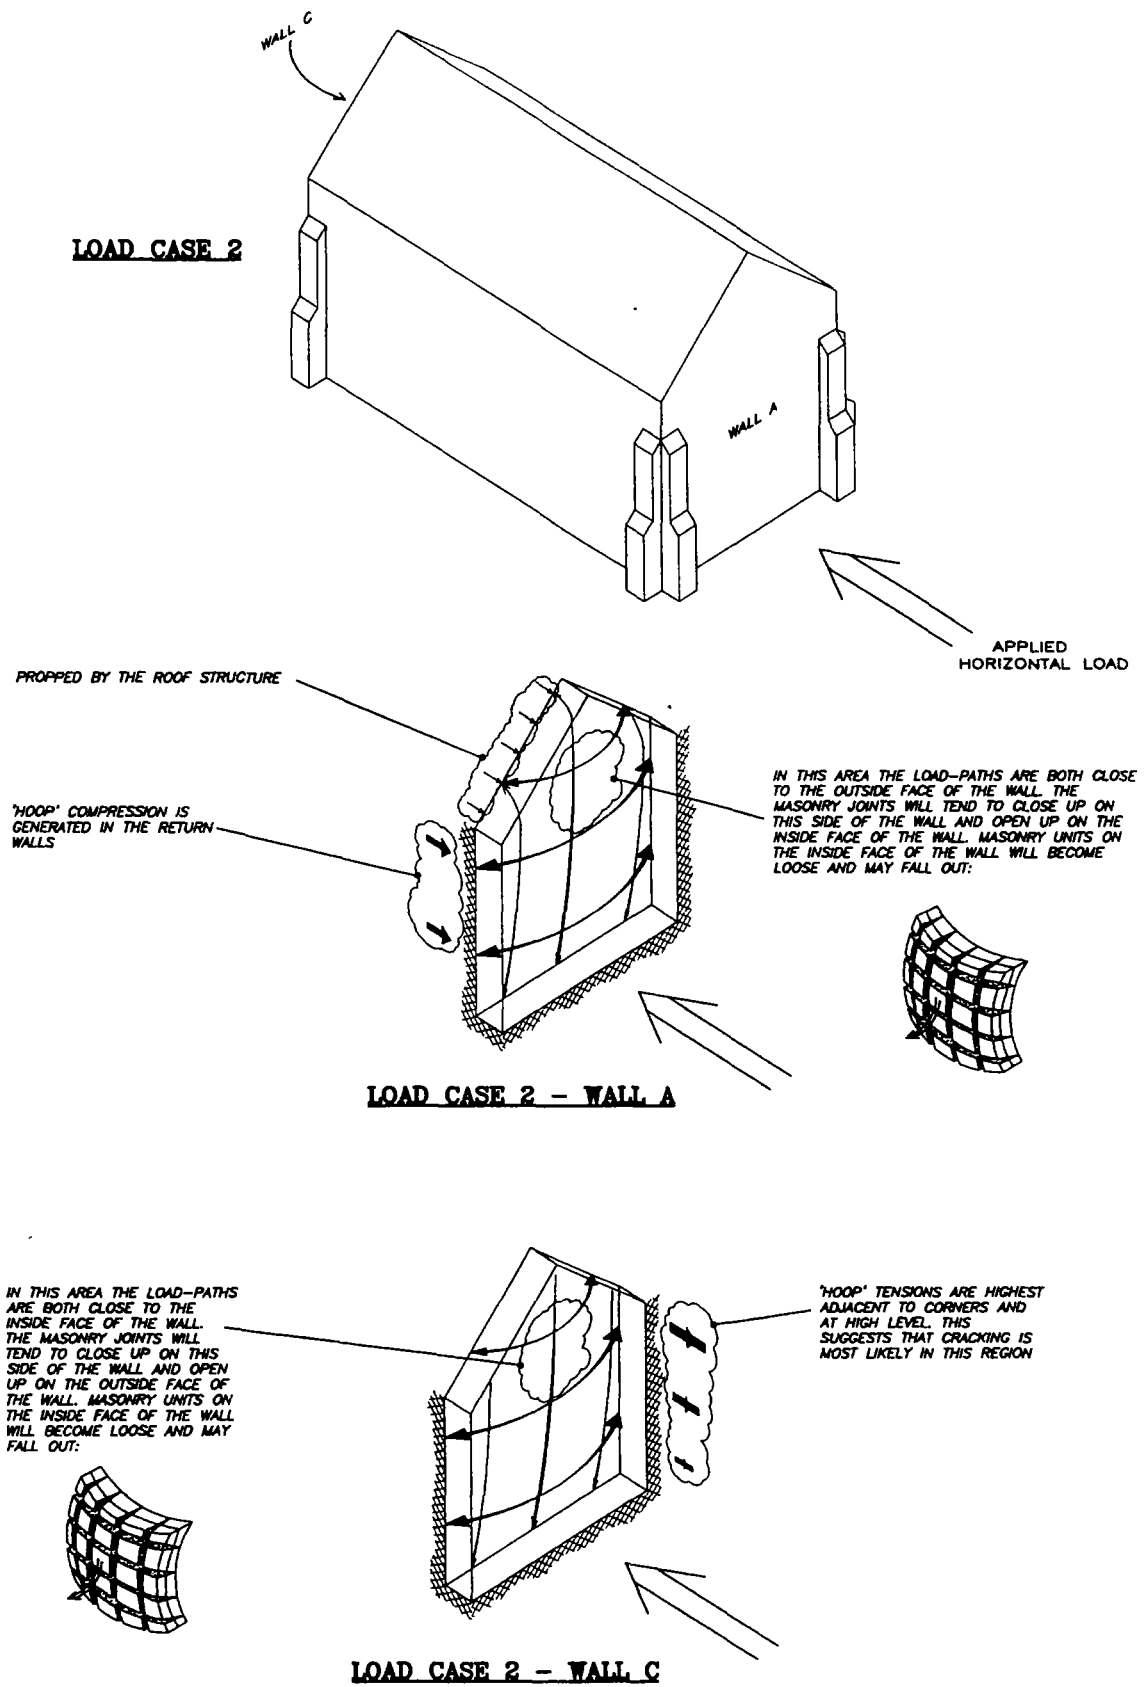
Load Case 2: Horizontal loading perpendicular to wall A
